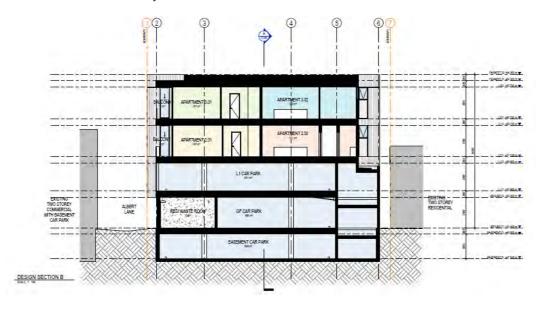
Cross section of amended proposal with basement, ground and level 1 site off the eastern boundary
